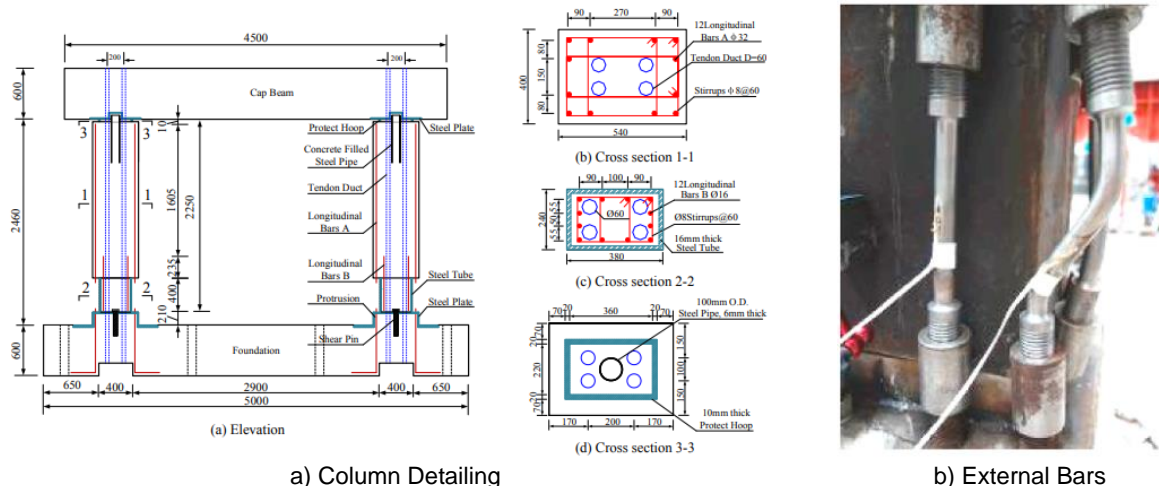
Column Detailing and Energy Dissipater Damage (Han et al., 2019)
